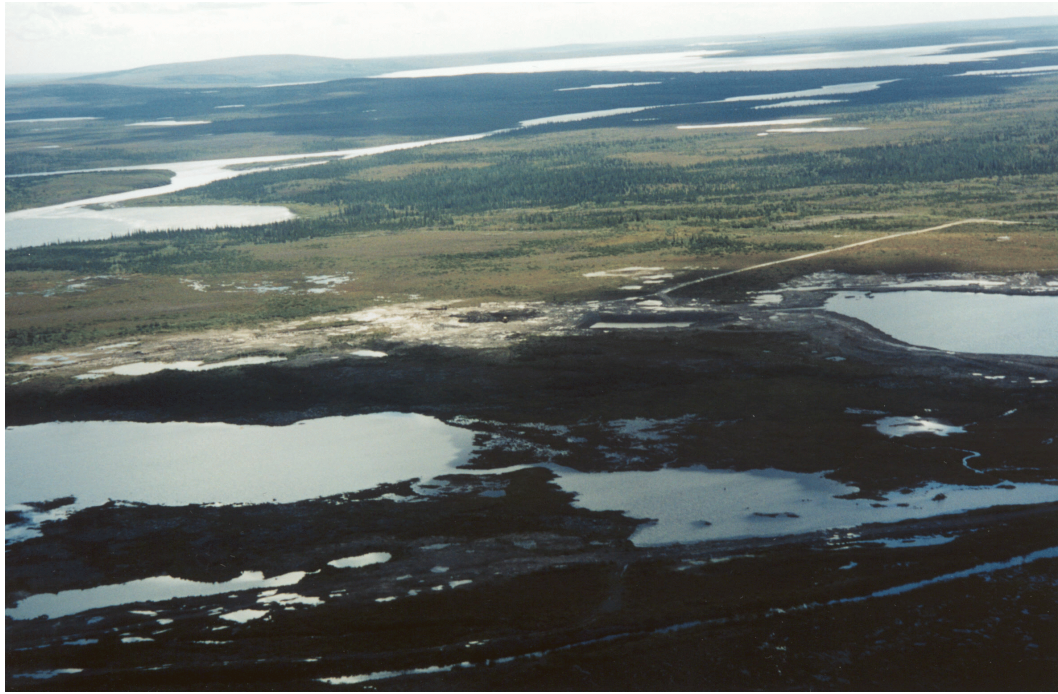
Aerial view of the Quarry Pit area (centre), with part of the Tailings Pond No. 1 (centre-right), and Tailing Ponds No. 2 (bottom). Kognak River is running across on top of the photo. Photo is looking southwest.
